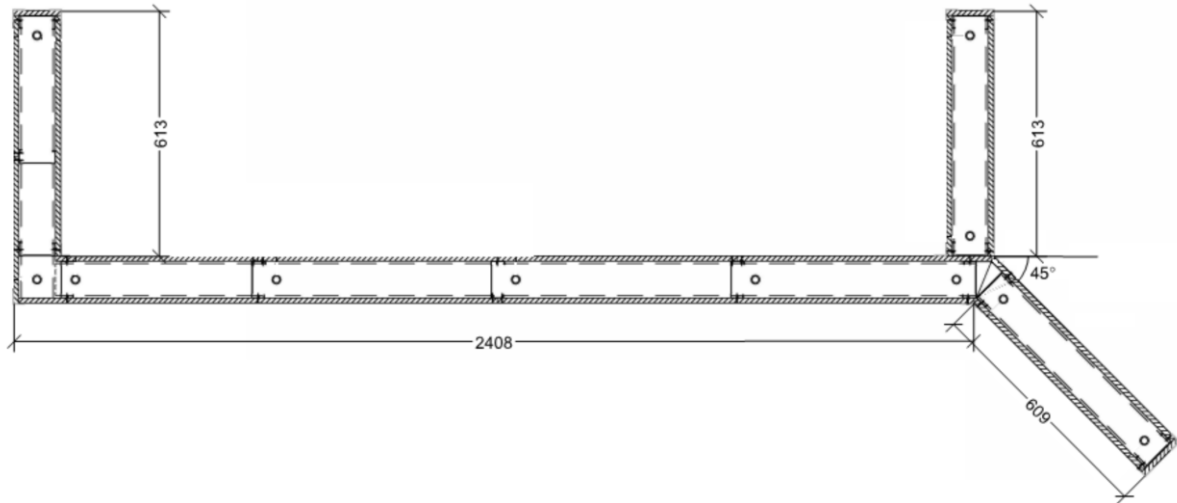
Plan view of typical “y-shape” wall configuration for specimens tested within this study and approximate dimensions (in mm).
